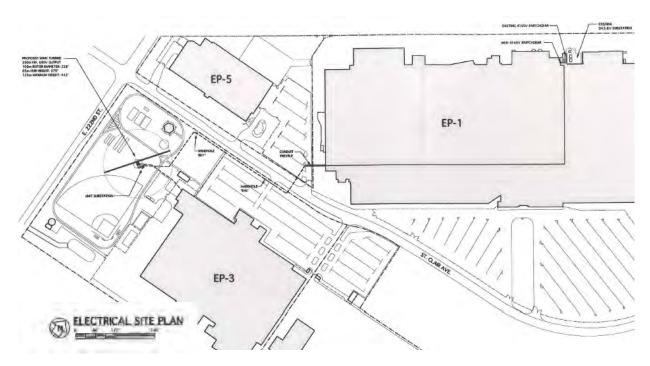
LEC Wind Turbine Electrical Site Plan.
